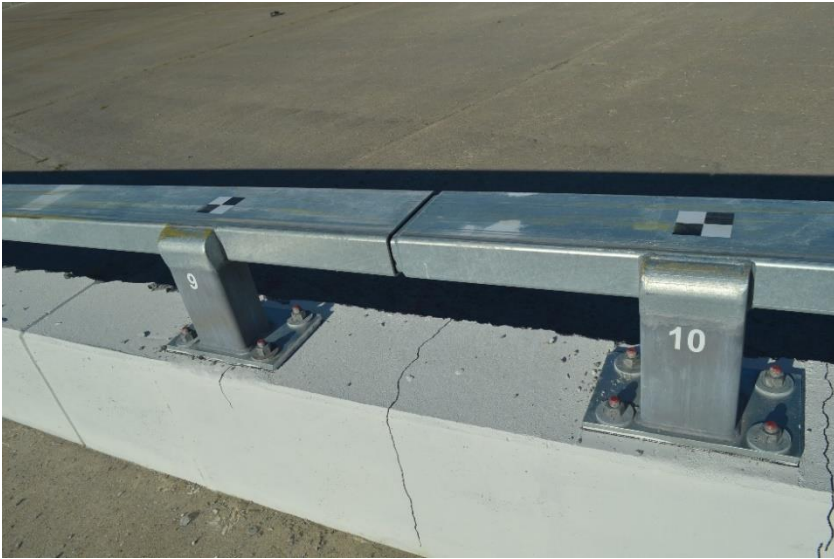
Rail and Post Damage, Post Nos. 10 and 9, Test No. MNCBR-1
